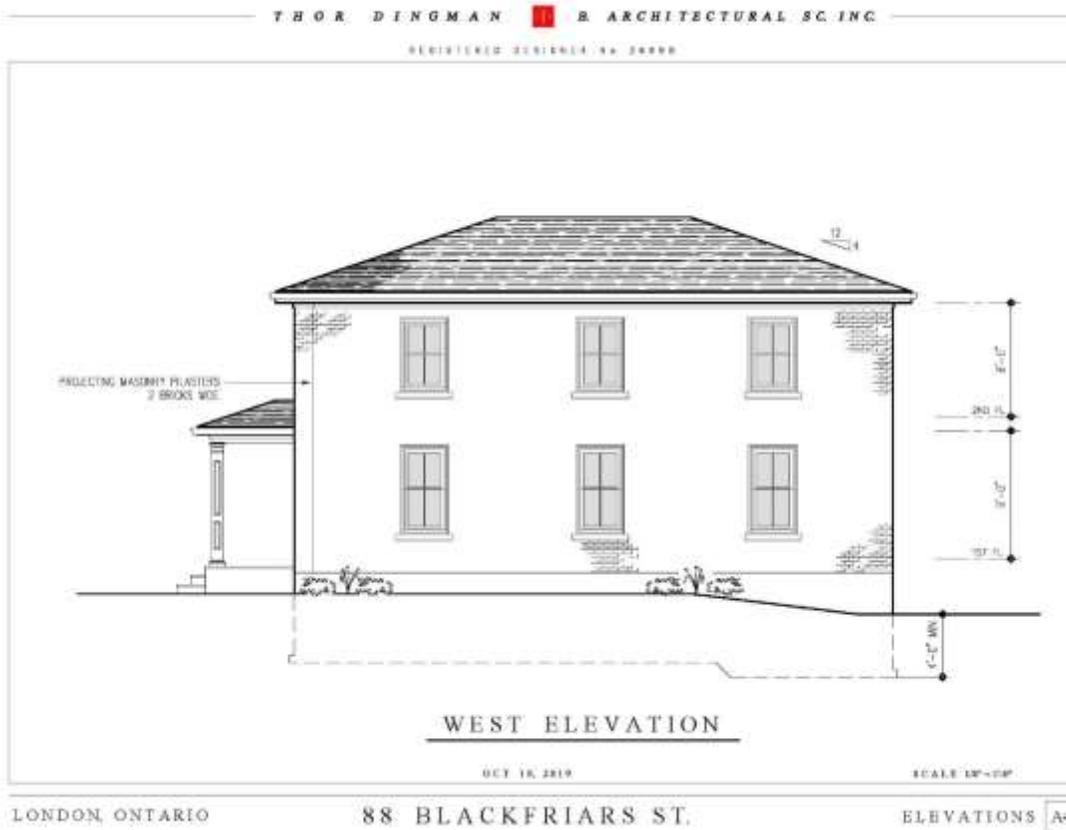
Side (west) elevation of the proposed building at 88 Blackfriars Street.
